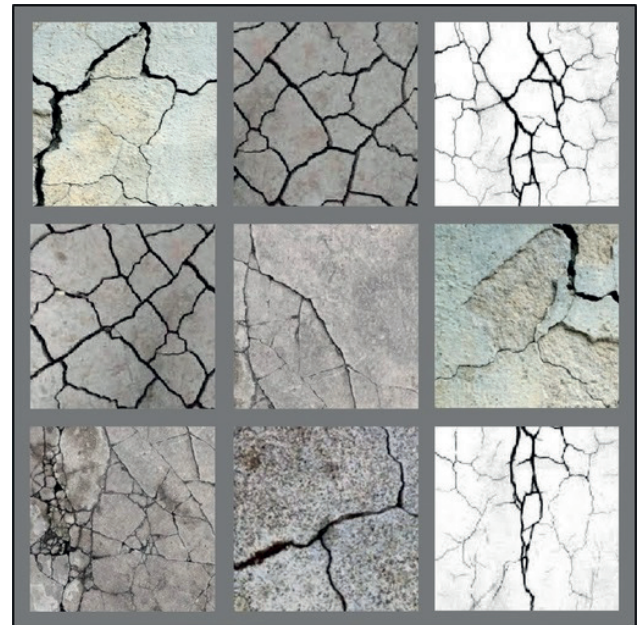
Some examples of the crack-damaged concrete surfaces
